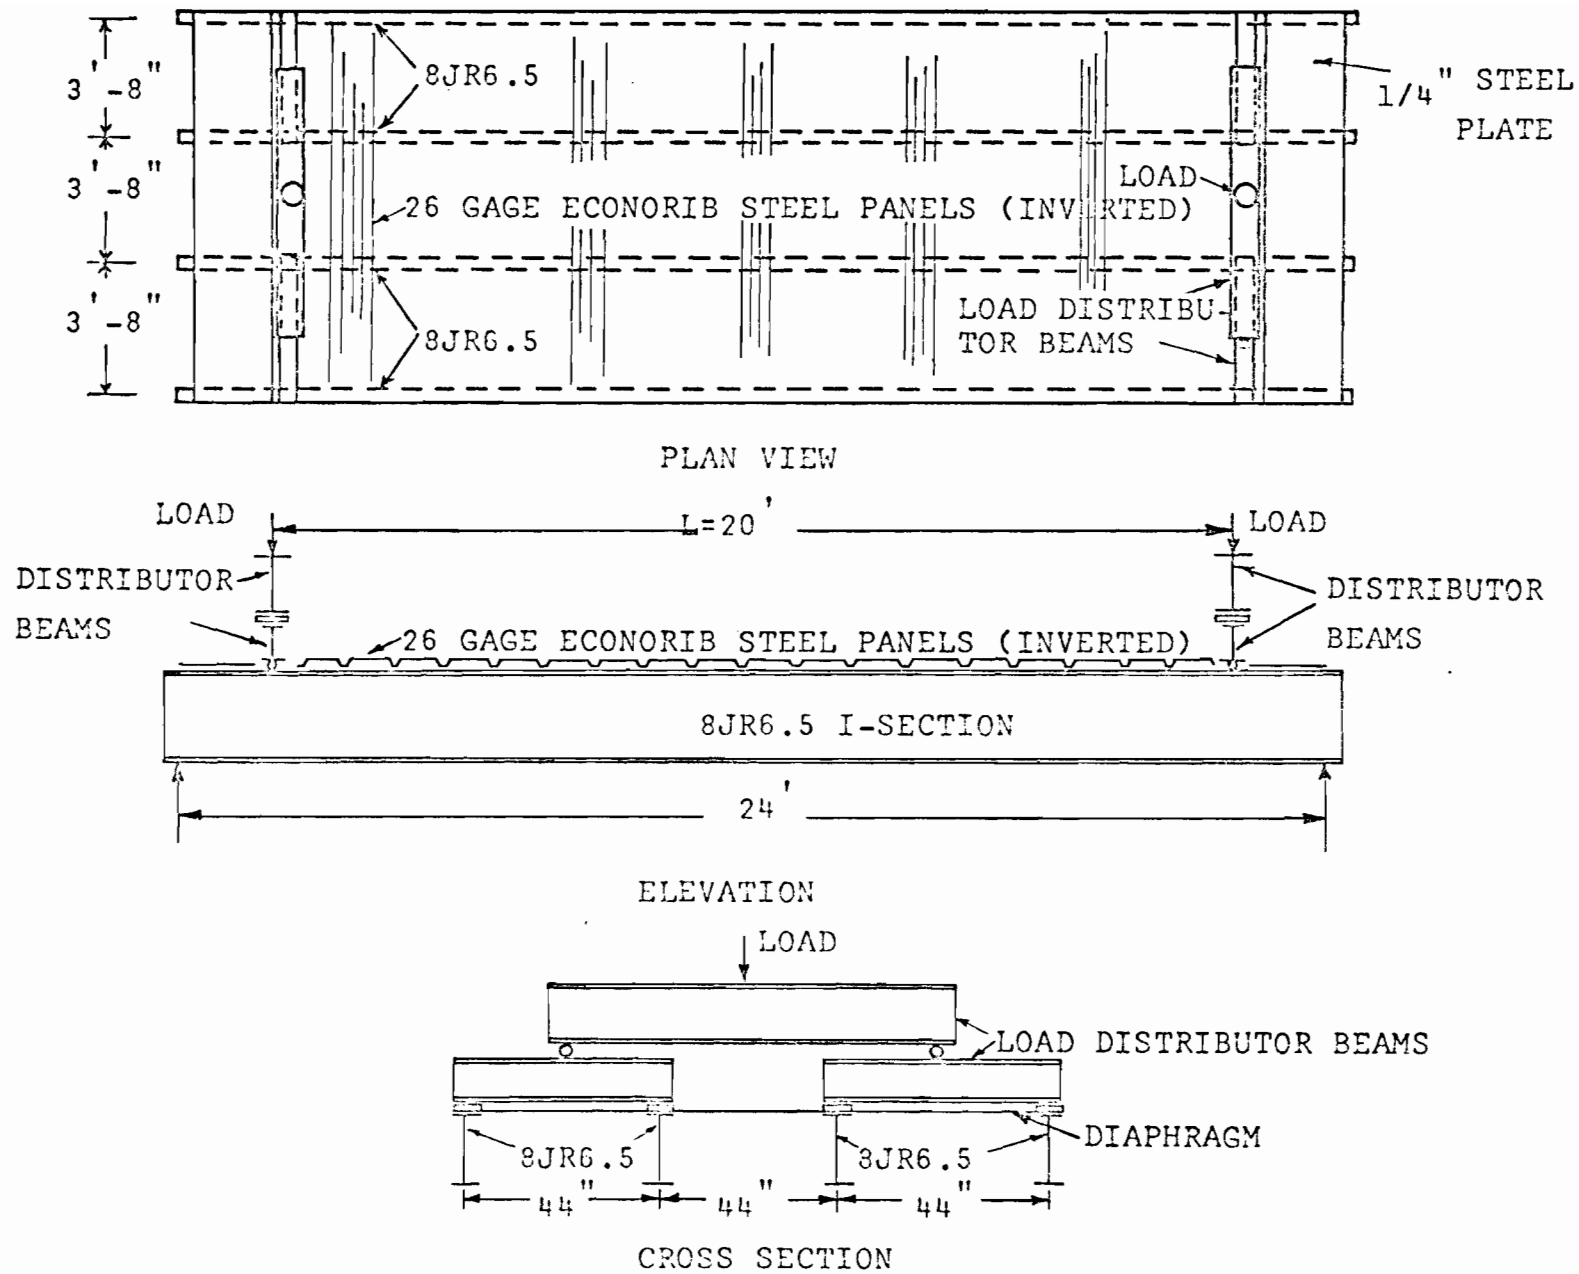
ARRANGEMENT FOR DIAPHRAGM-BRACED FOUR-BEAM FLEXURE TEST
